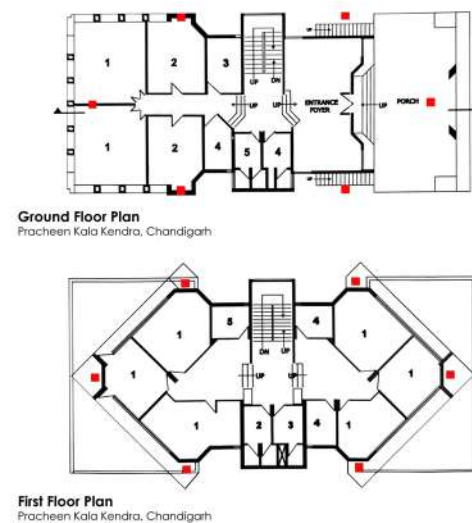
Plans of Pracheen Kala Kendra highlighting the columns
